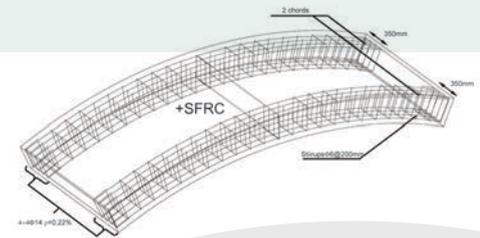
Possible reinforcement solution for precast segments: traditional rebars+fibers [44].
